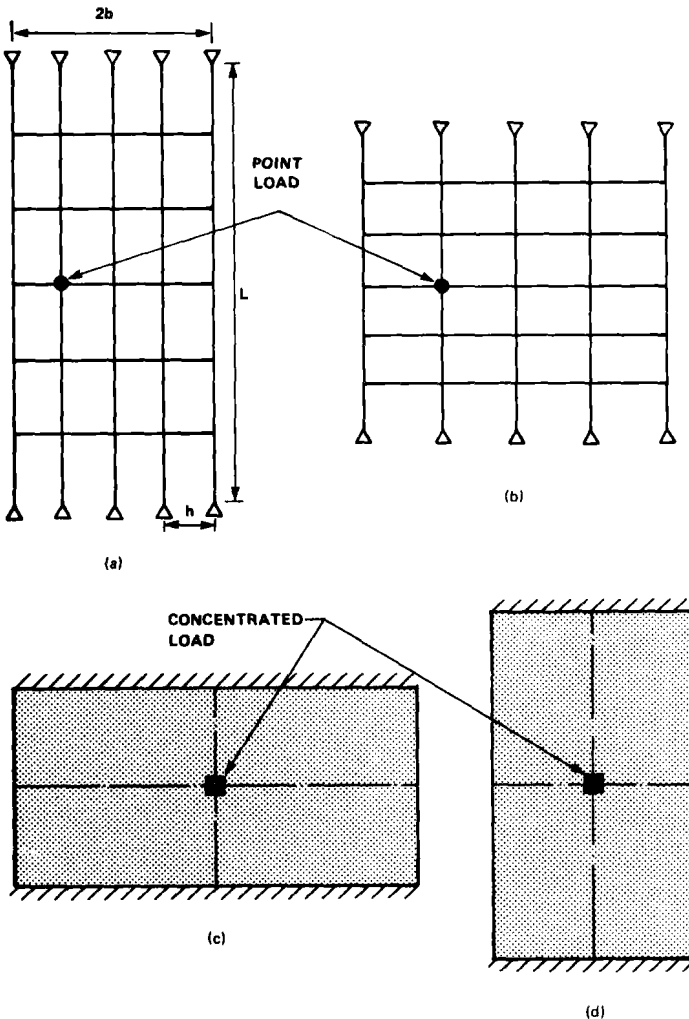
Plans for grillages and orthotropic plates: (a) grillage 1; (b) grillage 2; (c) orthotropic plate 1; (d) orthotropic plate 2.
